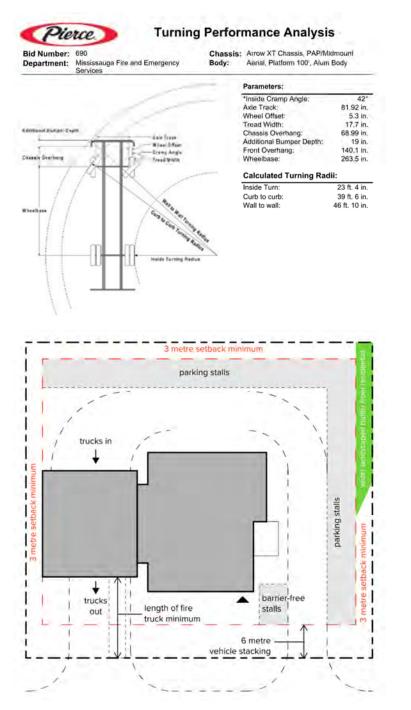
Fire truck turning radius and site plan design from the City of Mississauga Template Design and Standards for New Fire Stations (pages 29 and 47).
